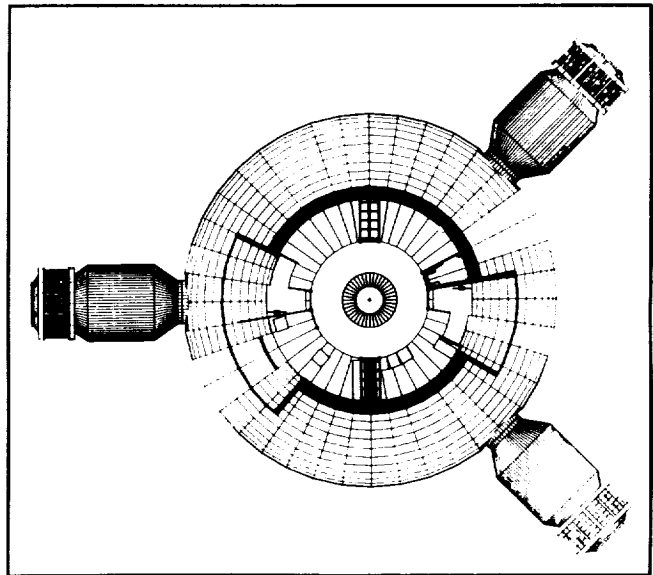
Upper level floor plan of *Domus I* -- crew support facility (wardroom, galley, library, recreation, exercise facility).
